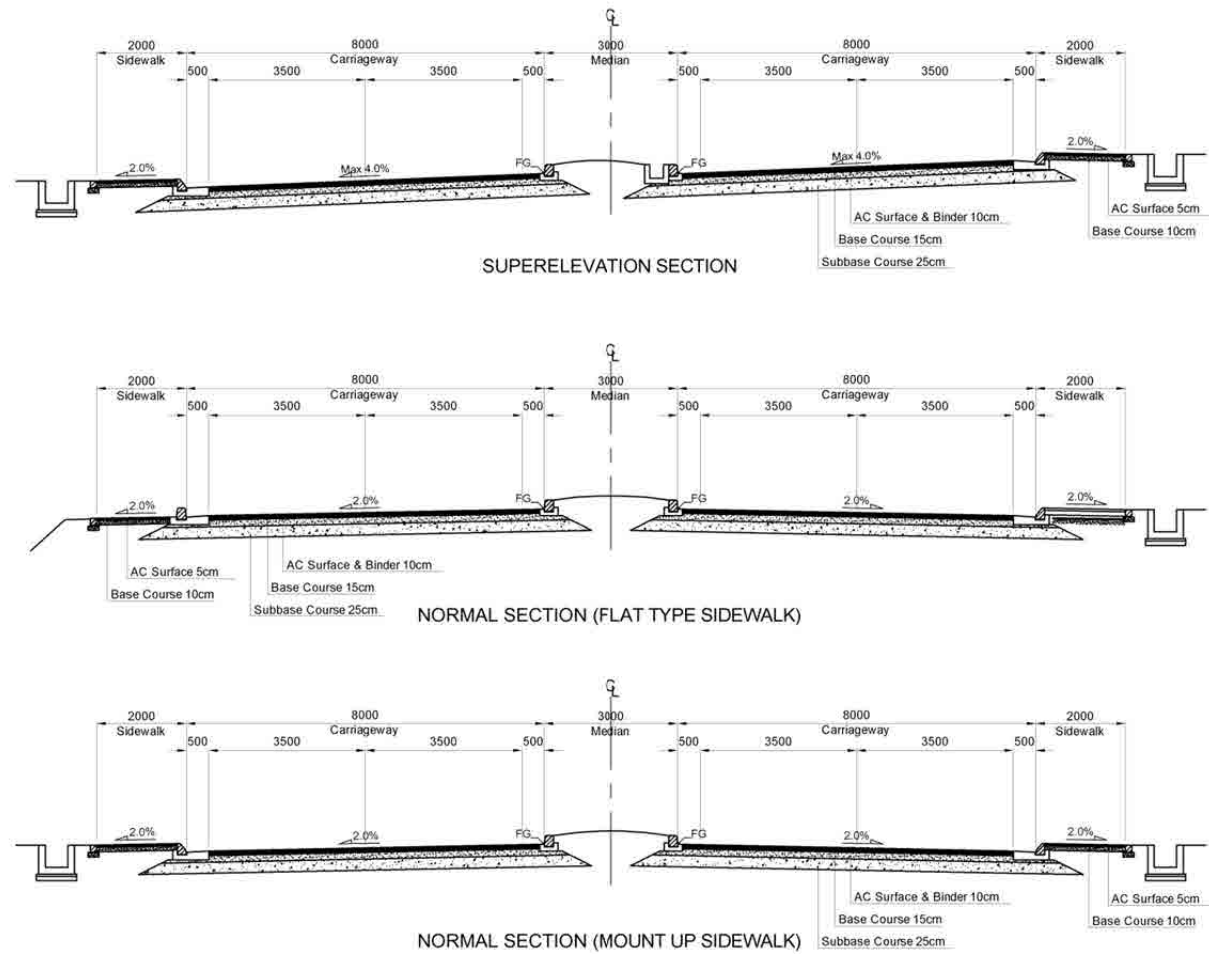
Typical Cross Section of the Kukum Highway
